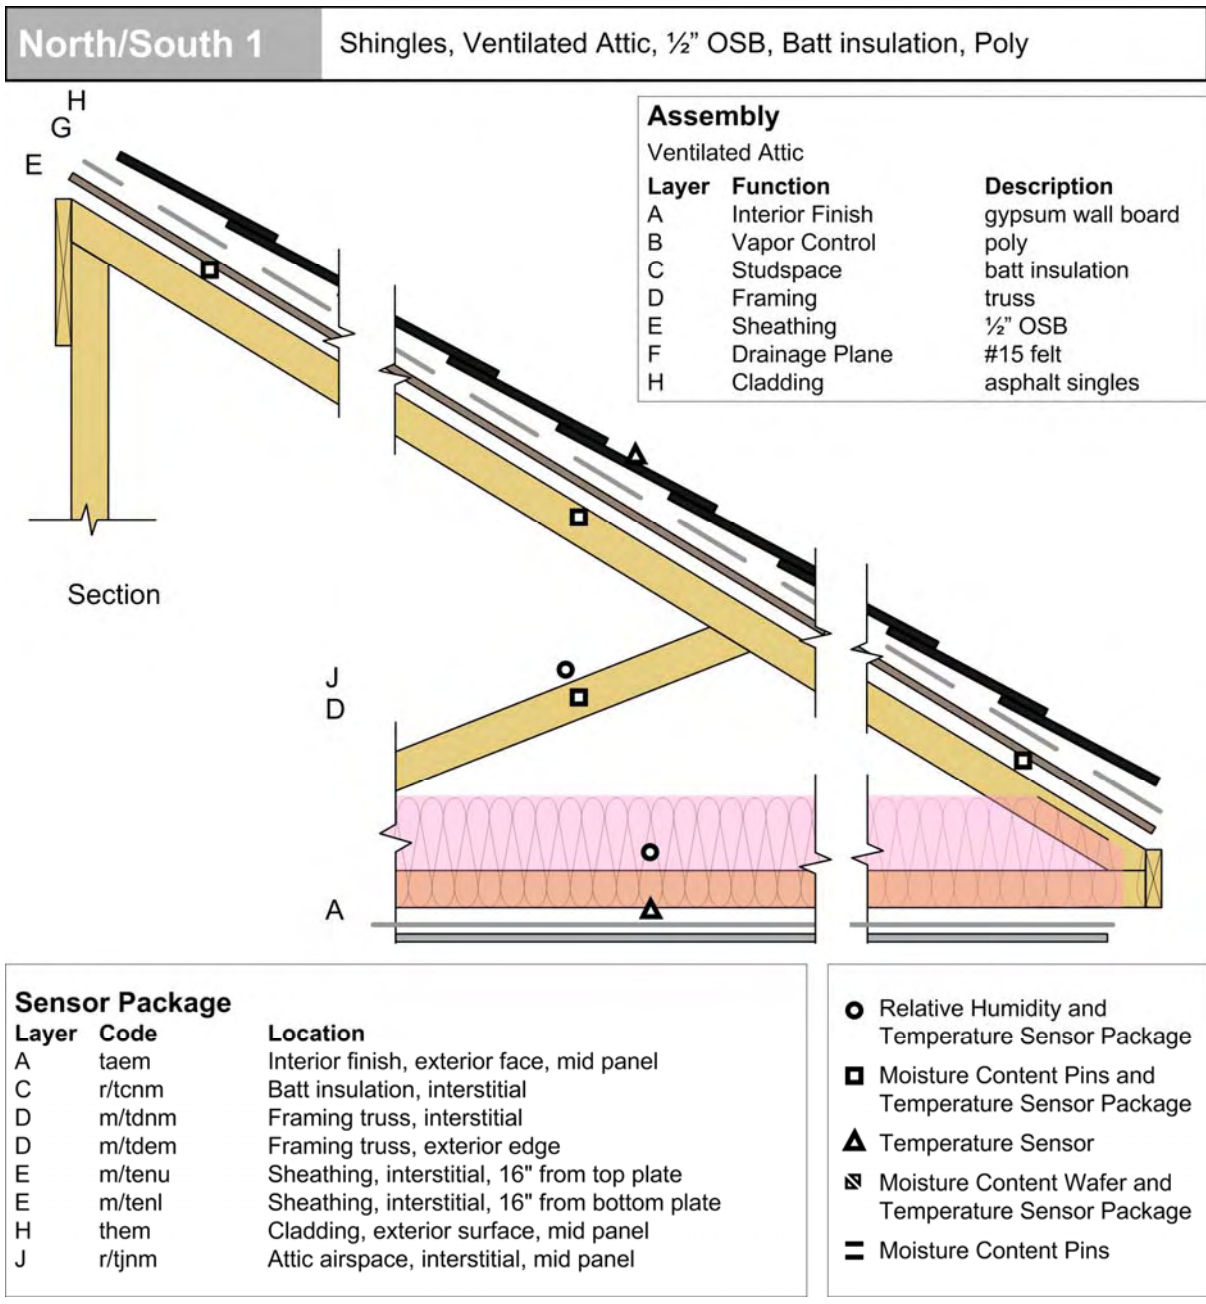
Test Roof 1: Conventional Ventilated Attic, construction and sensor layout
